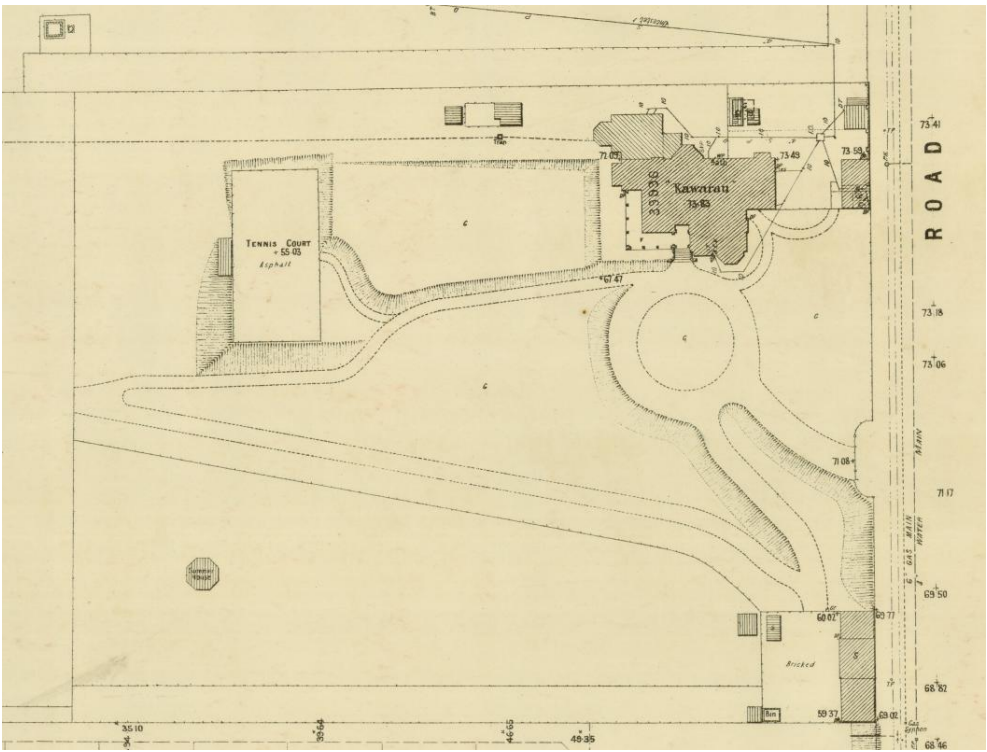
1916 MMBW Detail Plan no. 1520 showing the mansion with 1904 addition and property layout
